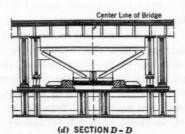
FLOOR EXPANSION DETAILS AT TOWER, CENTER SPAN.
